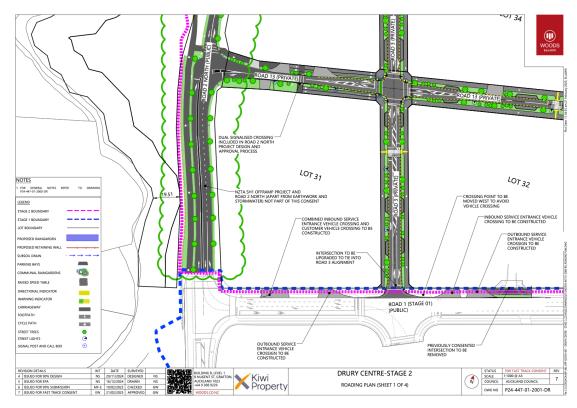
Drury Centre Stage 2, Proposed Roading Plan (Sheet 1 of 4) – DWG. P24-447-01-2001-DR, Revision 7, dated 21.02.2025, prepared by Woods
